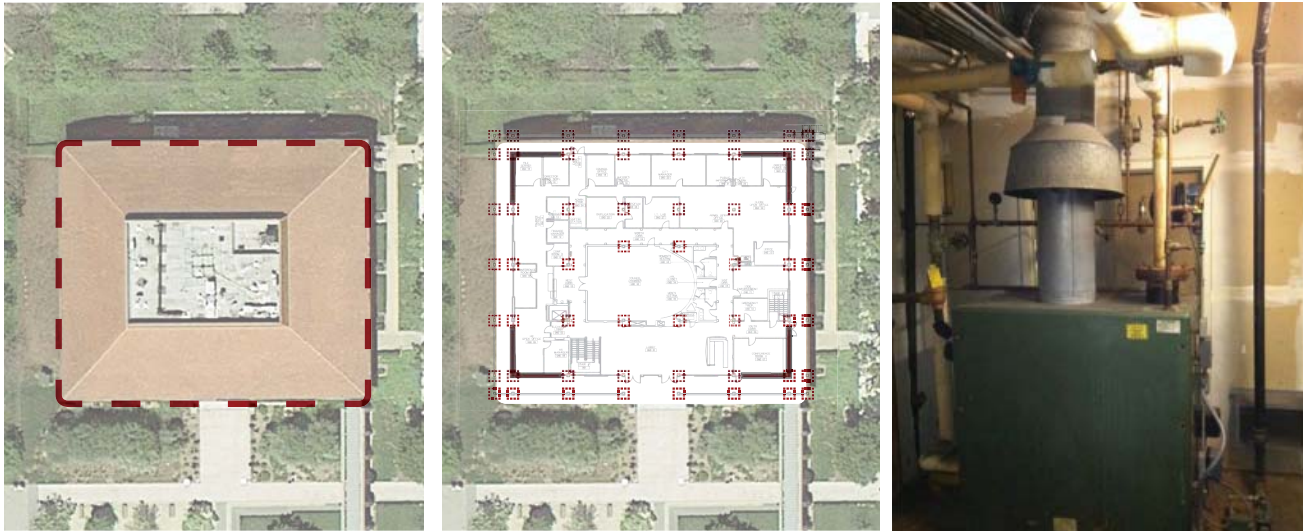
Significant structural challenges due to heavy roof and weak columns
